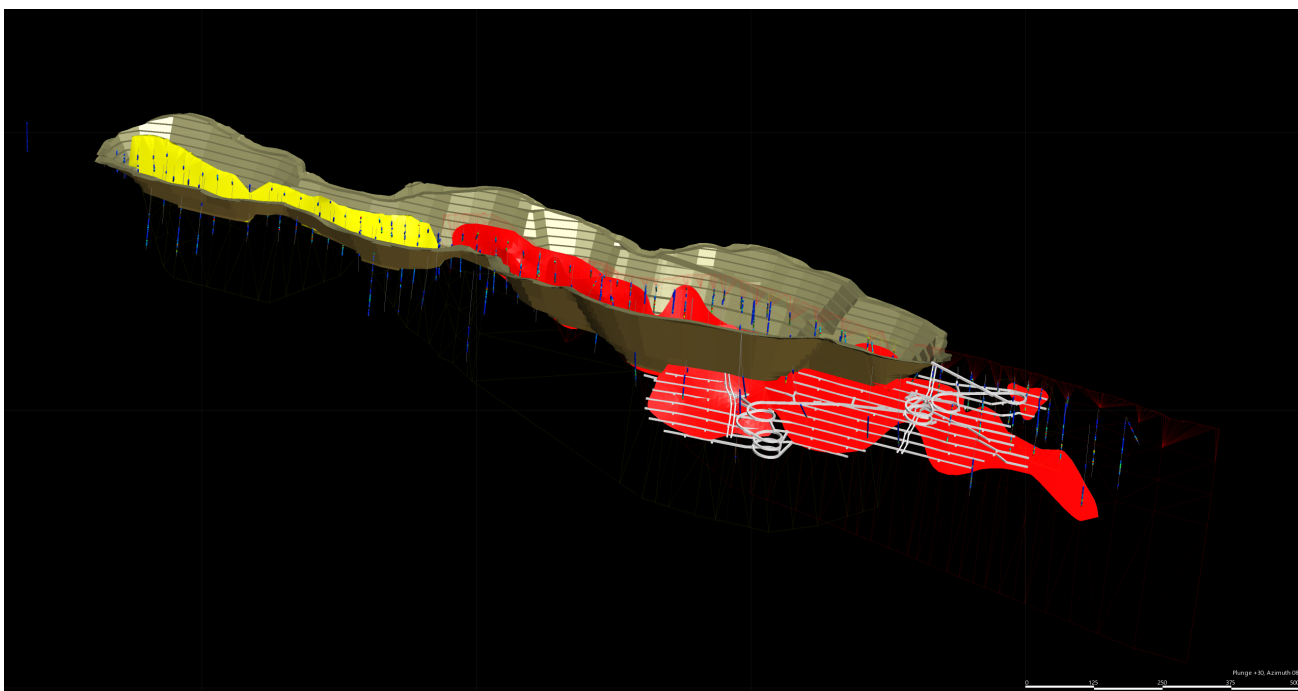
Final Open Pit Mine Design with Preliminary Underground Design
